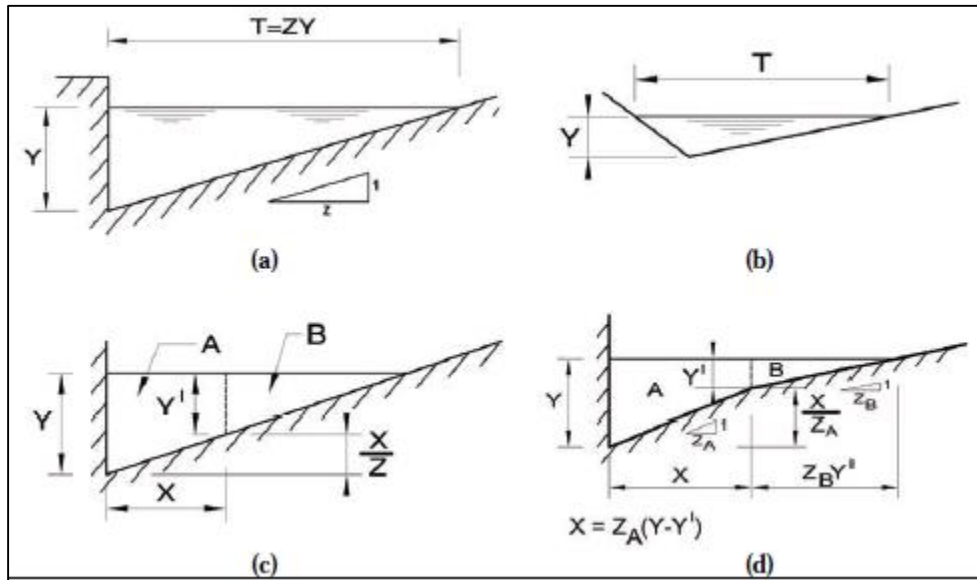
Cross section of typical kerbs (SANRAL, 2006)
